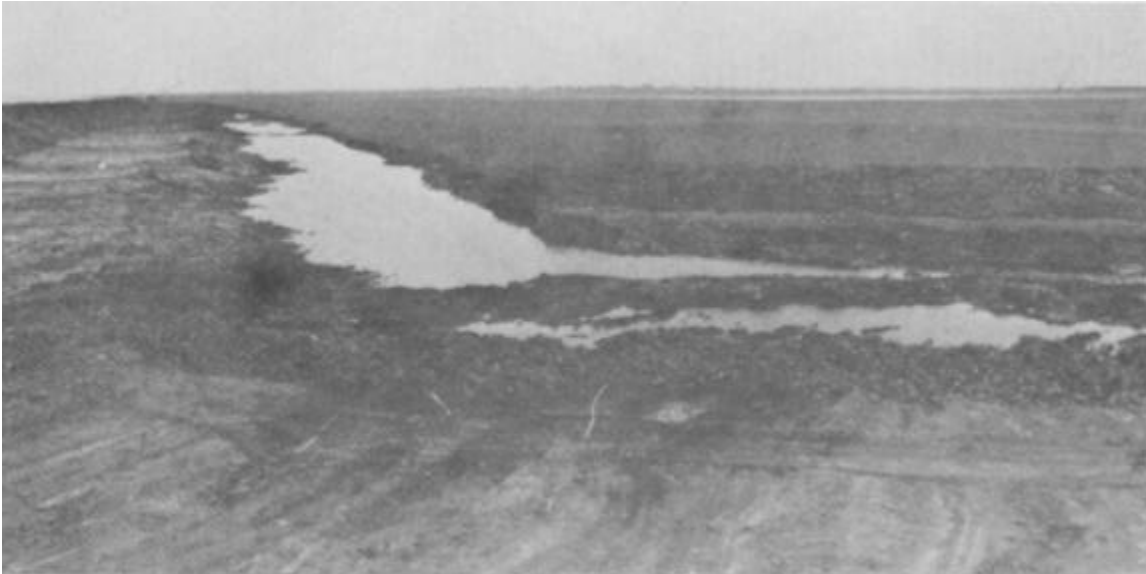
A well-developed perimeter trenching system, Morris Island Disposal Site, Charleston District
